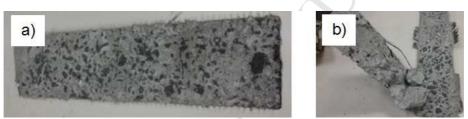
(a) Interfacial failure of the soffit strip, (b) Concrete cover separation of the U-jacket
